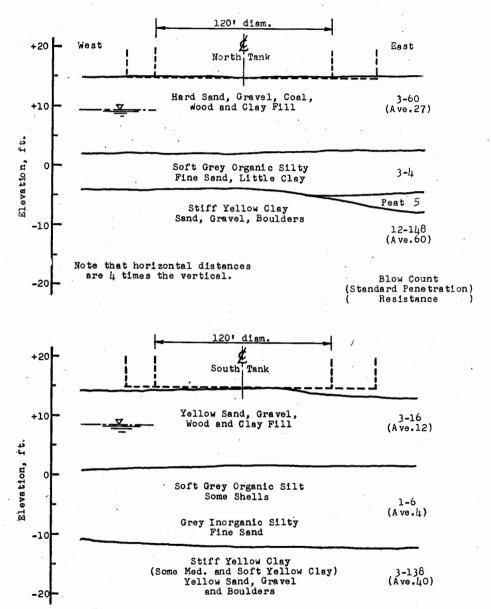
Soil Conditions Below Proposed Oil Storage Tanks.
